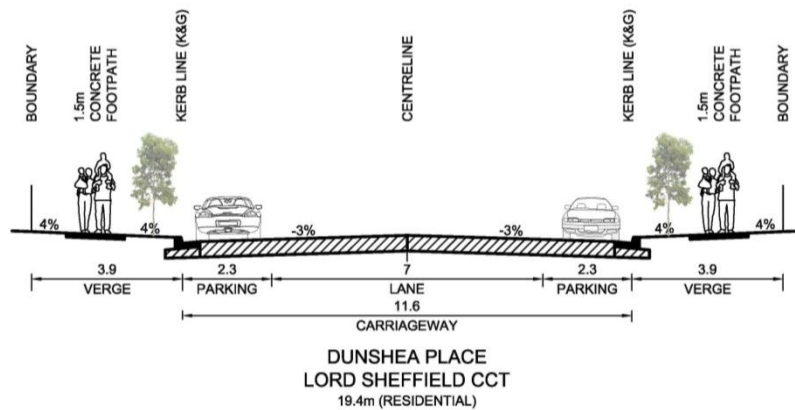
Street Cross Section (Lord Sheffield Circuit and Dunshea Place)
